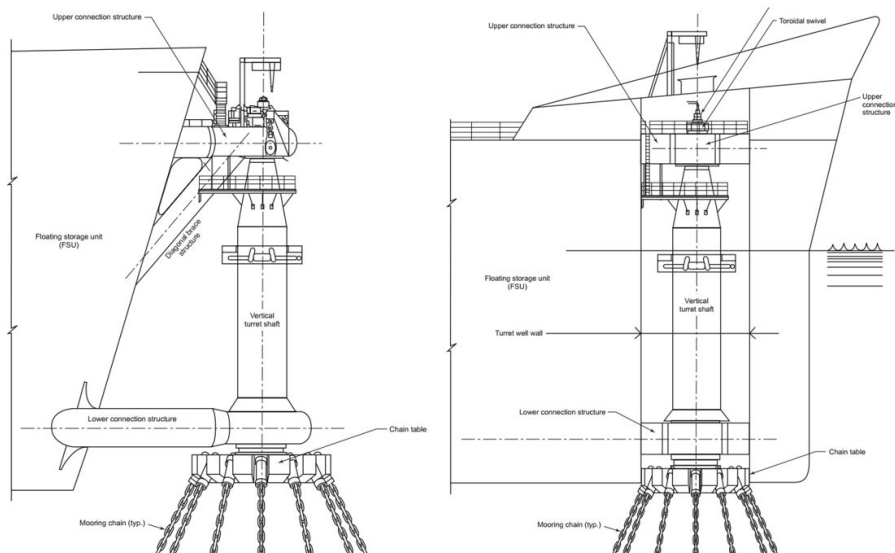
Turret external (left) and internal (right) turret mooring arrangement
